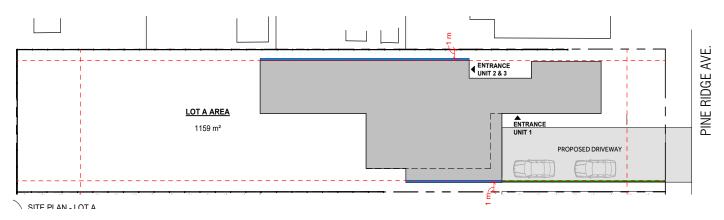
Proposed 1m Setbacks (0.2m encroachments)
